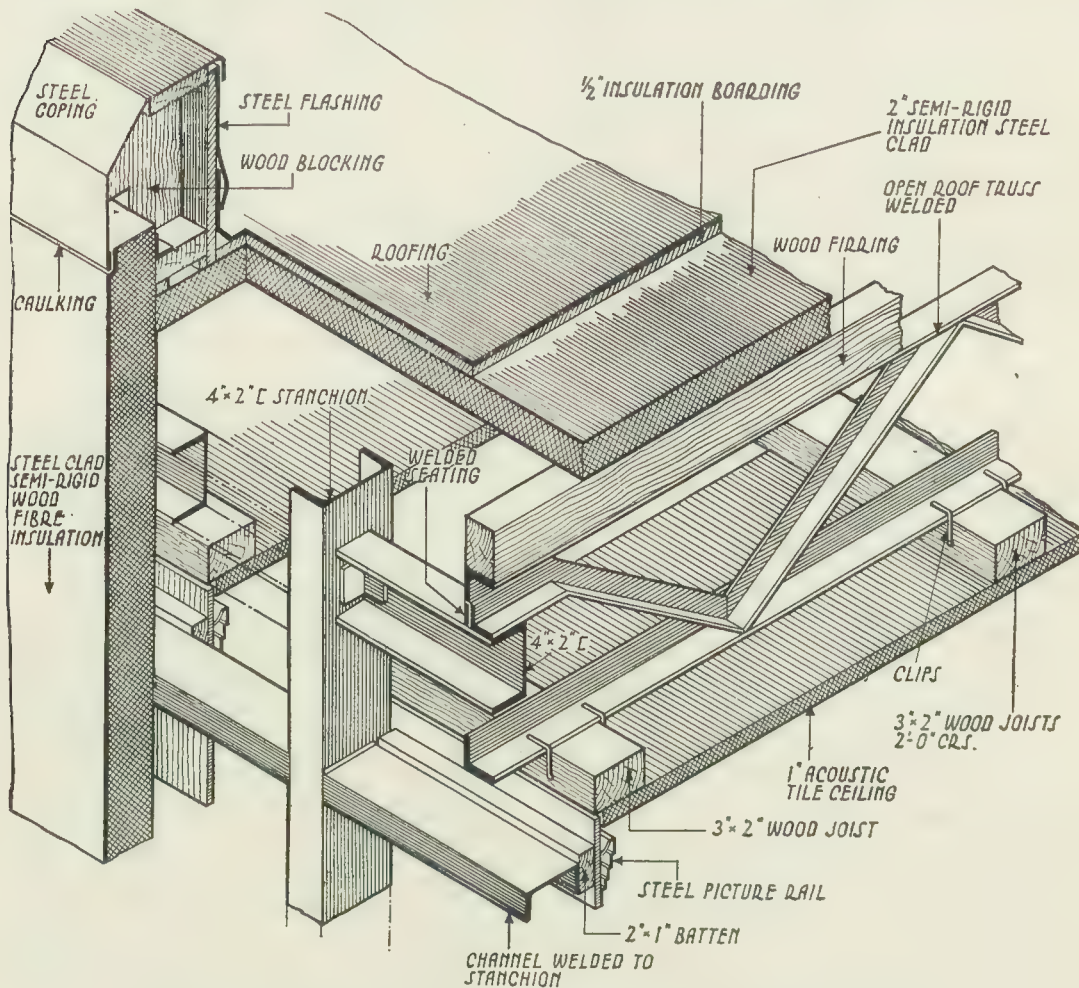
CONSTRUCTION OF FLAT ROOF SHOWING BUILT-UP COVERINGS AND STEEL FLASHING
